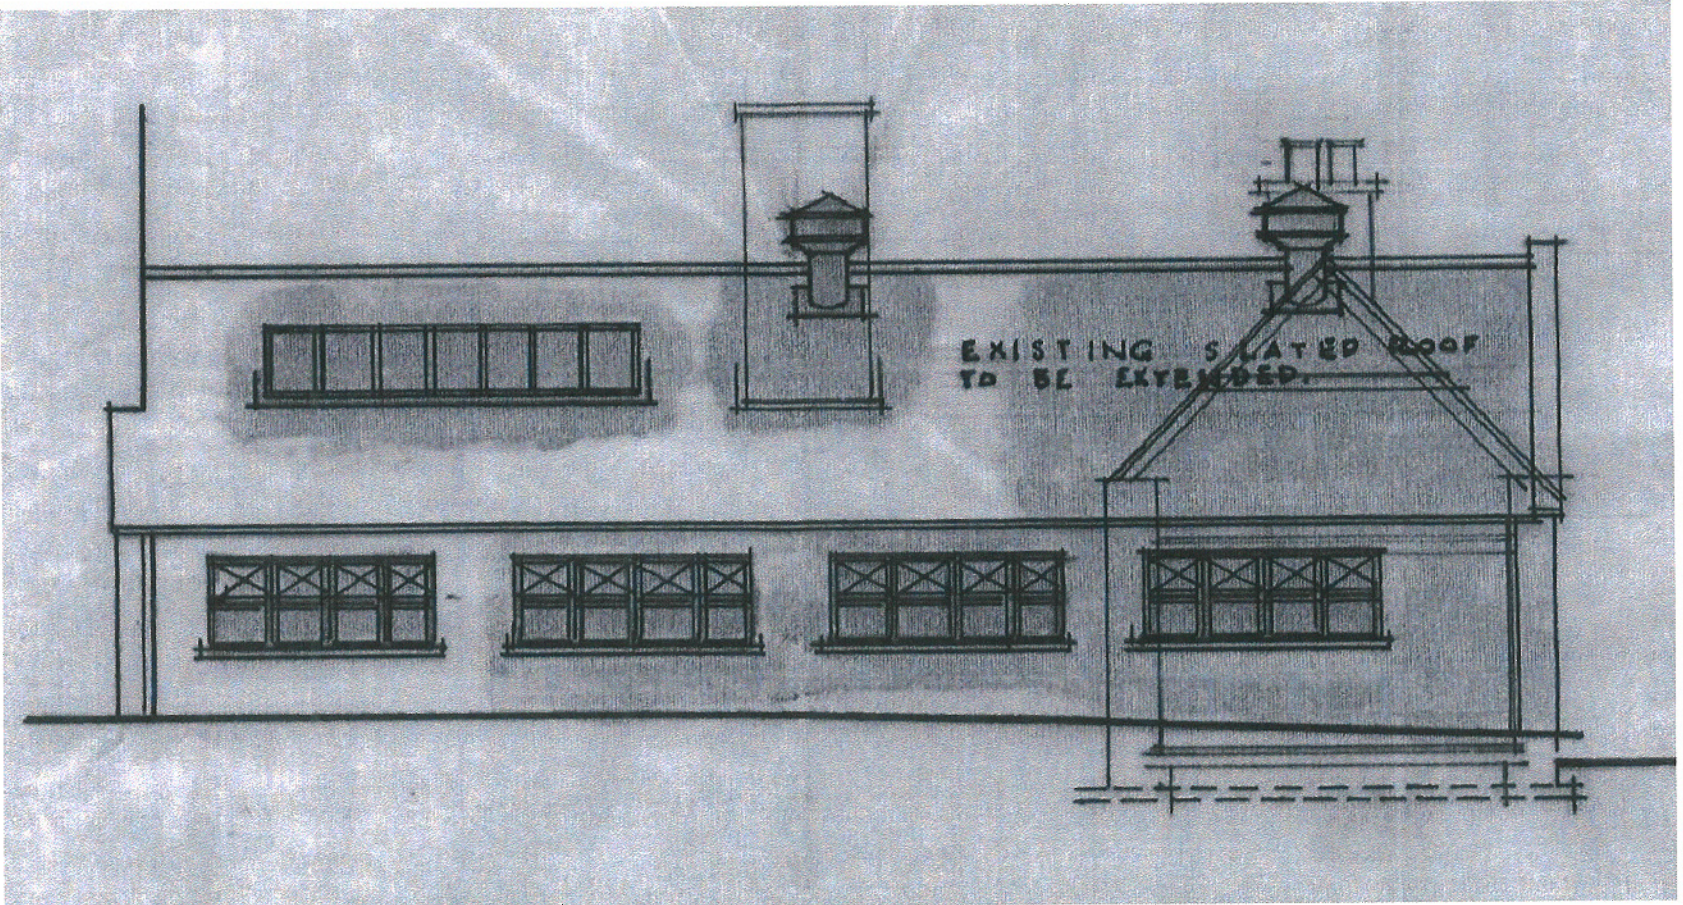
South Elevation of Bakery 1960 scale 1/8" = 1ft.
